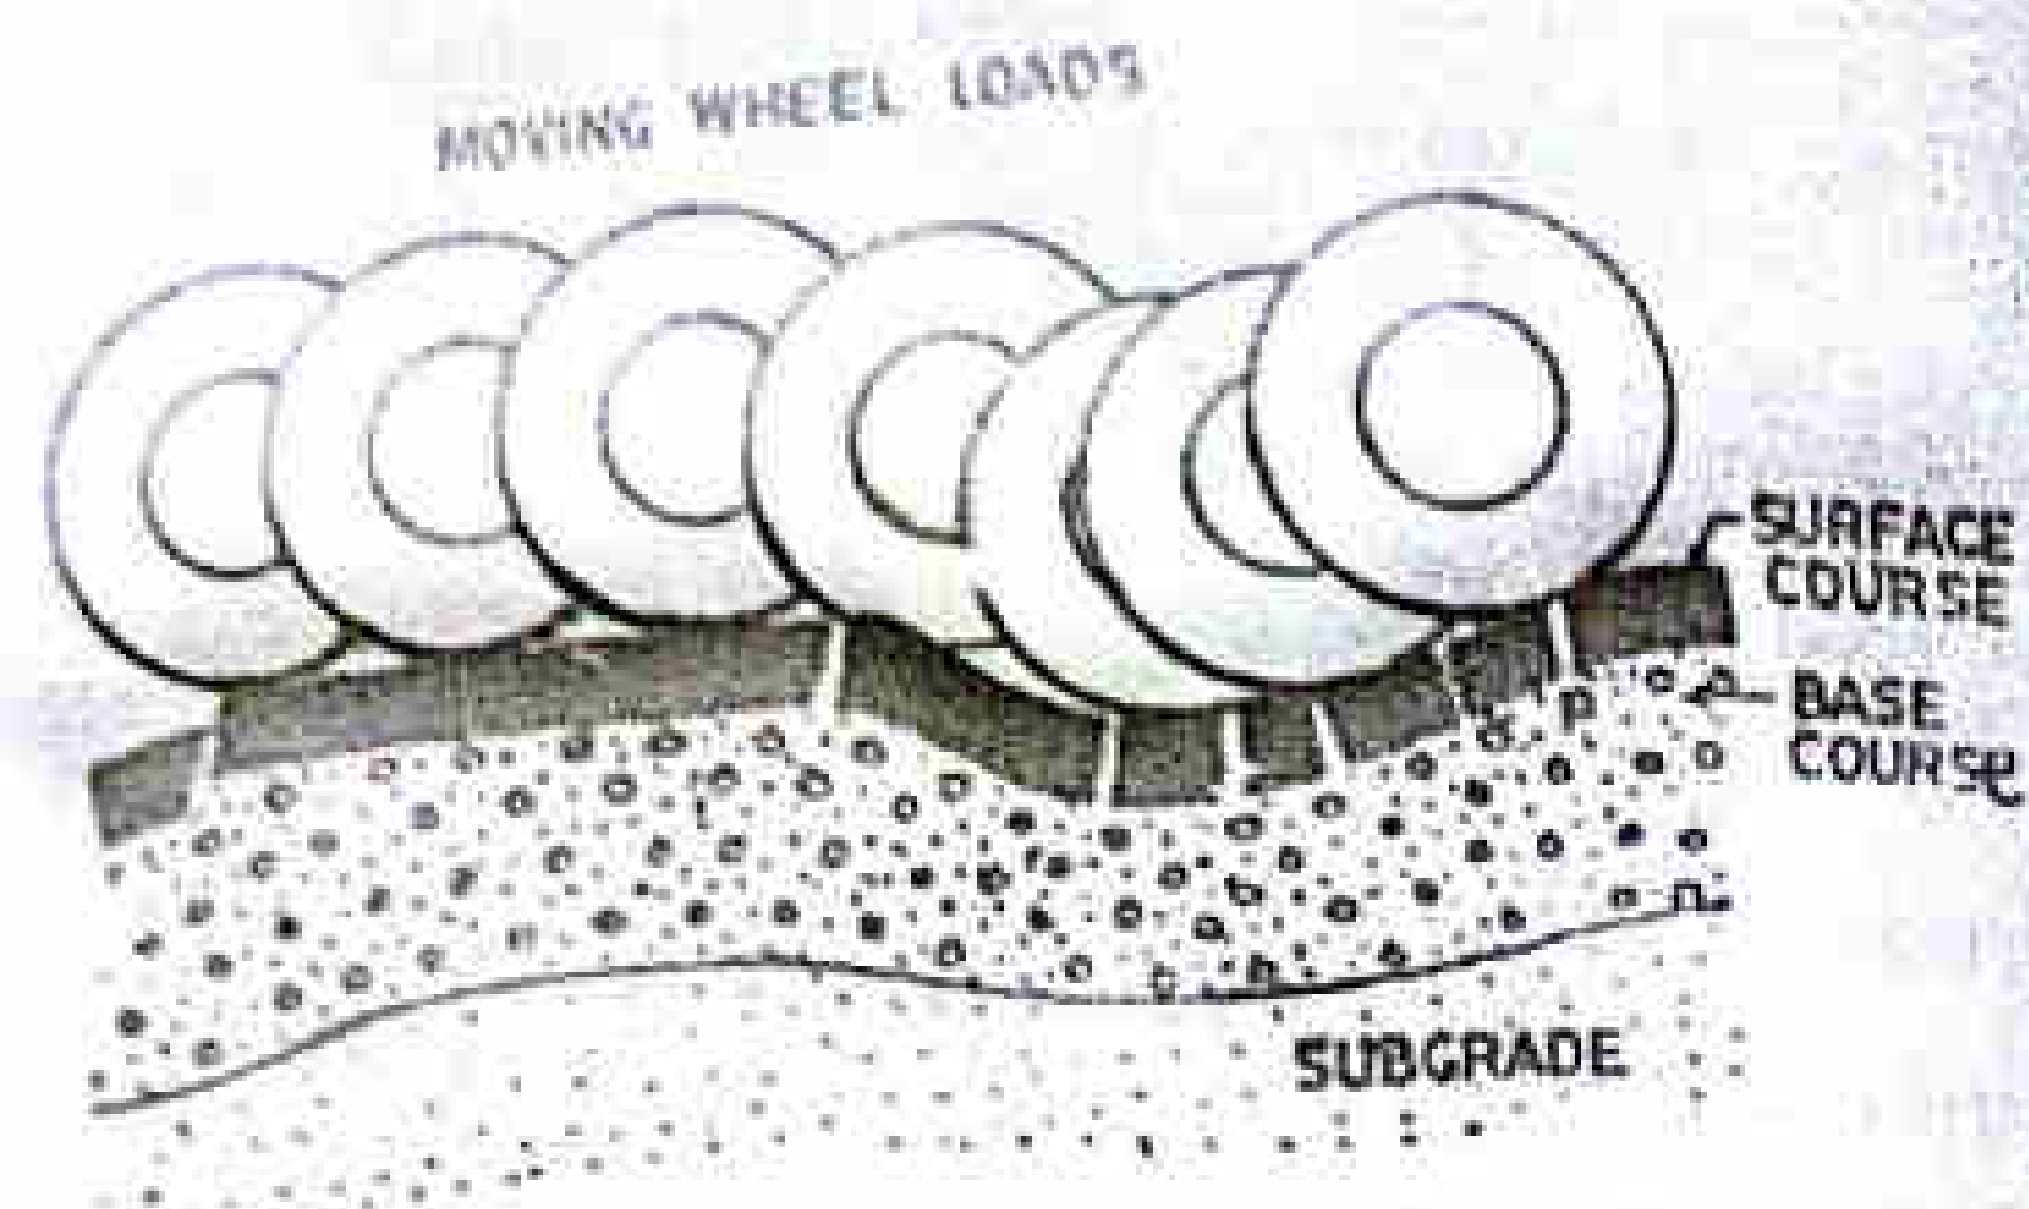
Failure due to Improper Compaction of Subgrade and Pavement Layers
